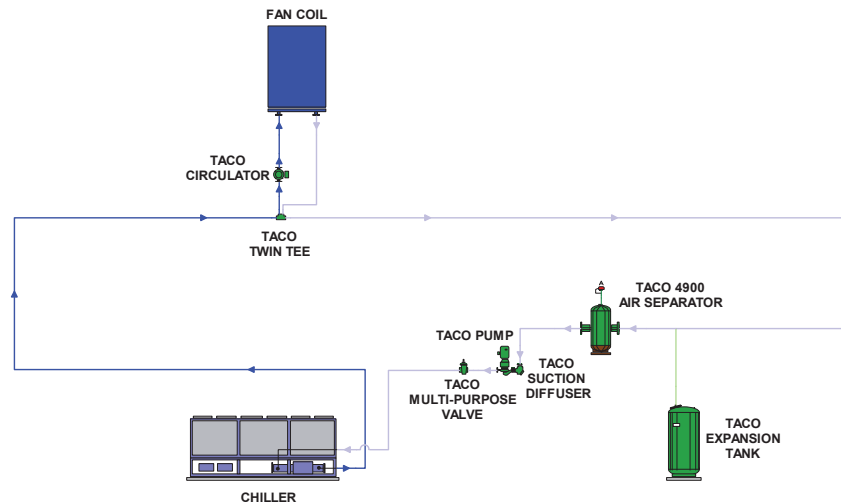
Chiller and Expansion Tank/Air Separator Location
